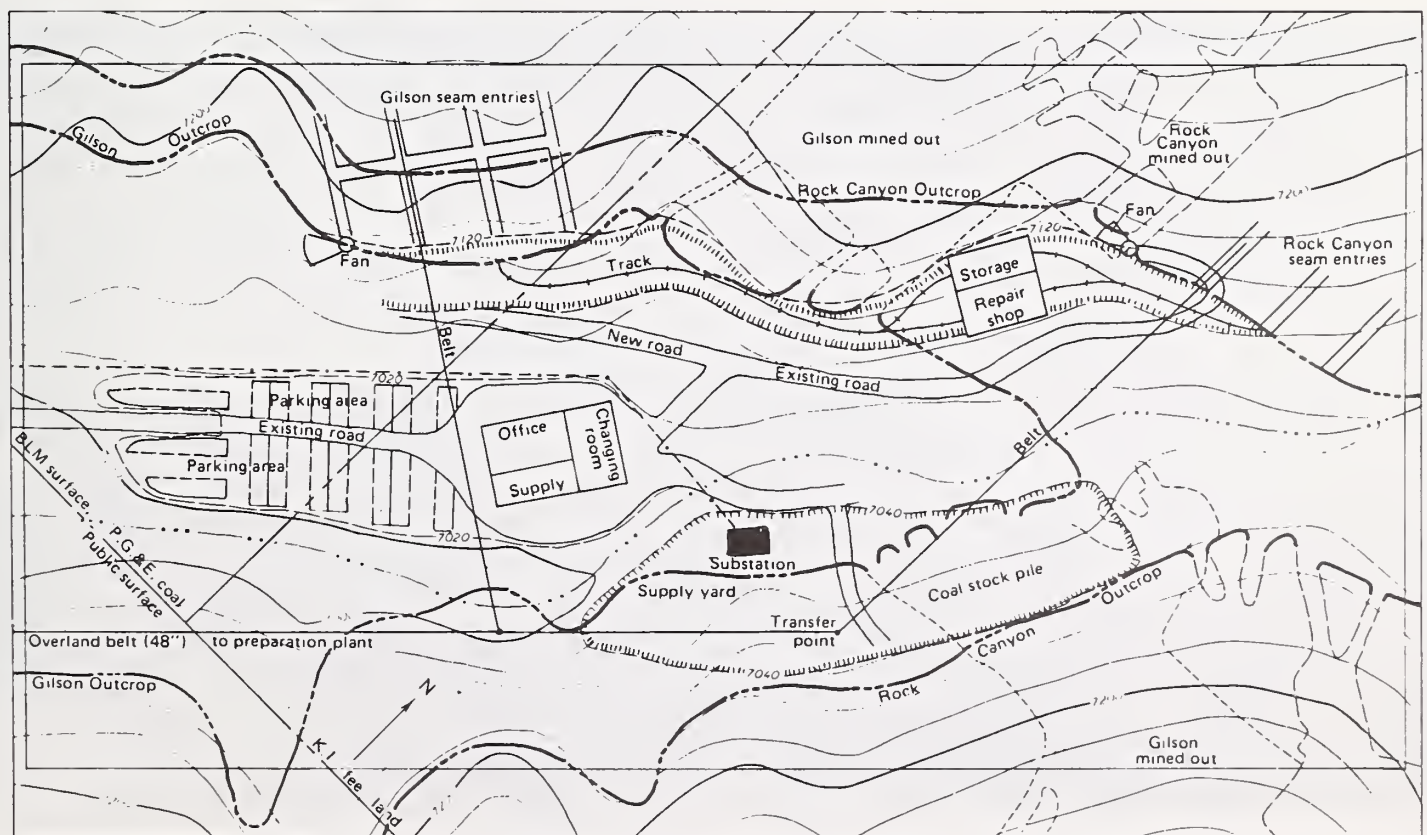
Surface facility layout of a typical Utah underground coal mine. (David Morris, John T. Boyd Co)
